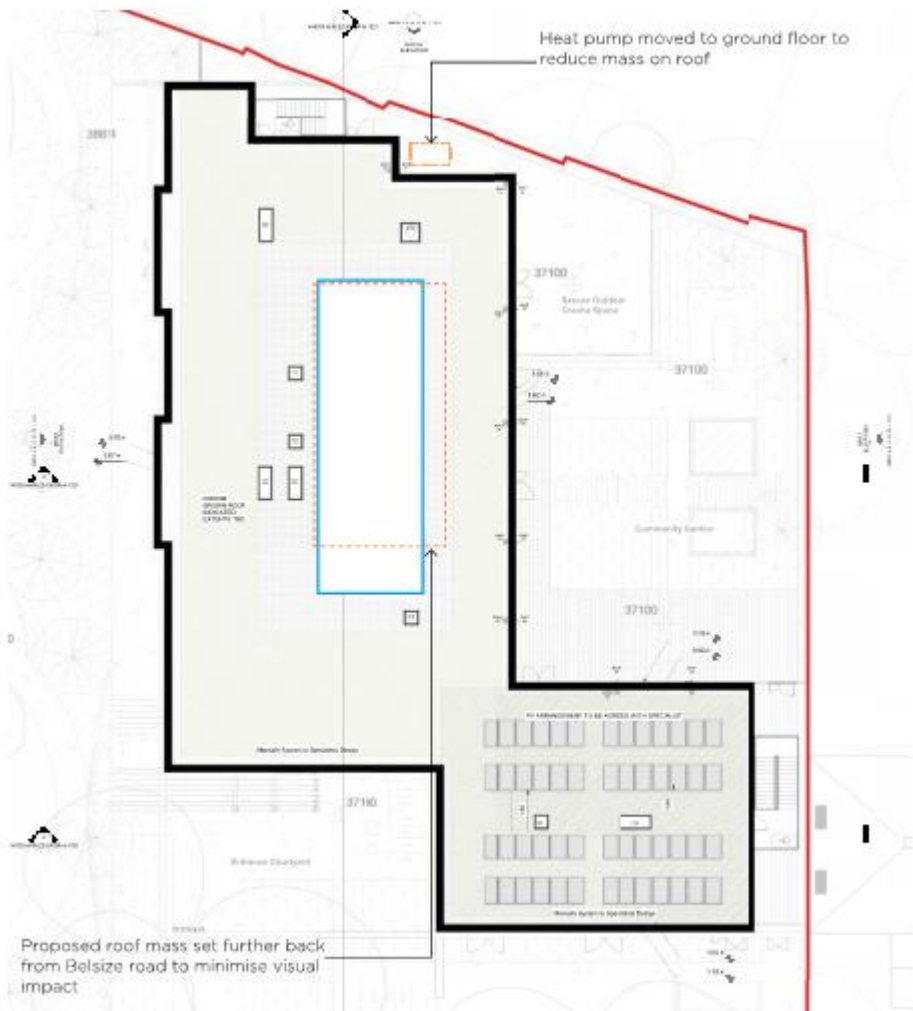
Approved and proposed roof plan, showing pump in rear garden
